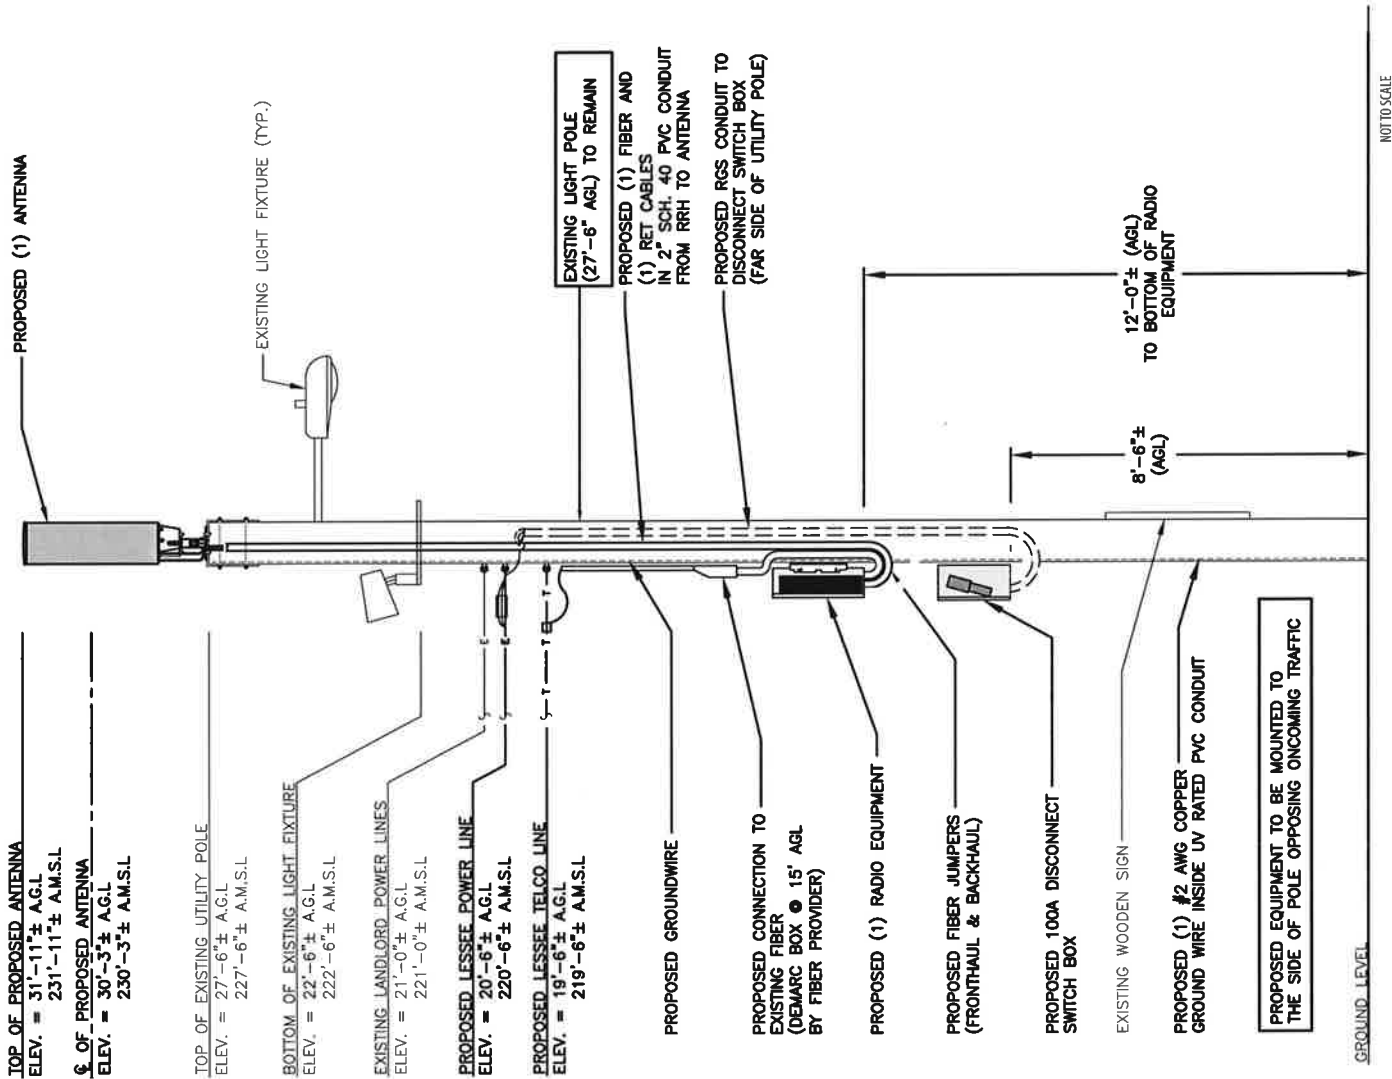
PROPOSED EQUIPMENT LOCATION AND ELEVATION PLAN
